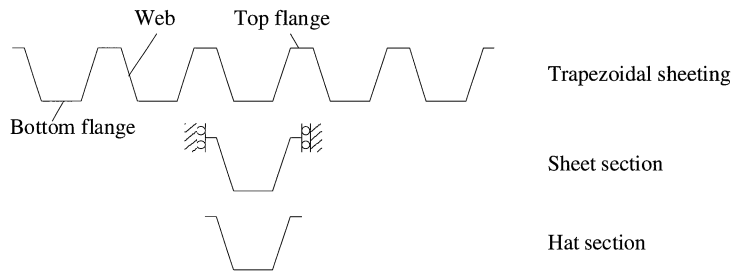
Definitions of trapezoidal sheeting, sheet sections, and hat sections.
